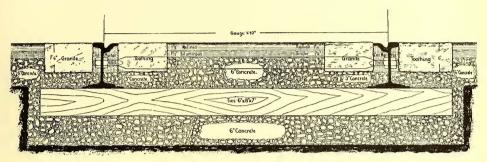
CROSS-SECTION OF COMPLETED 1906 CONSTRUCTION
